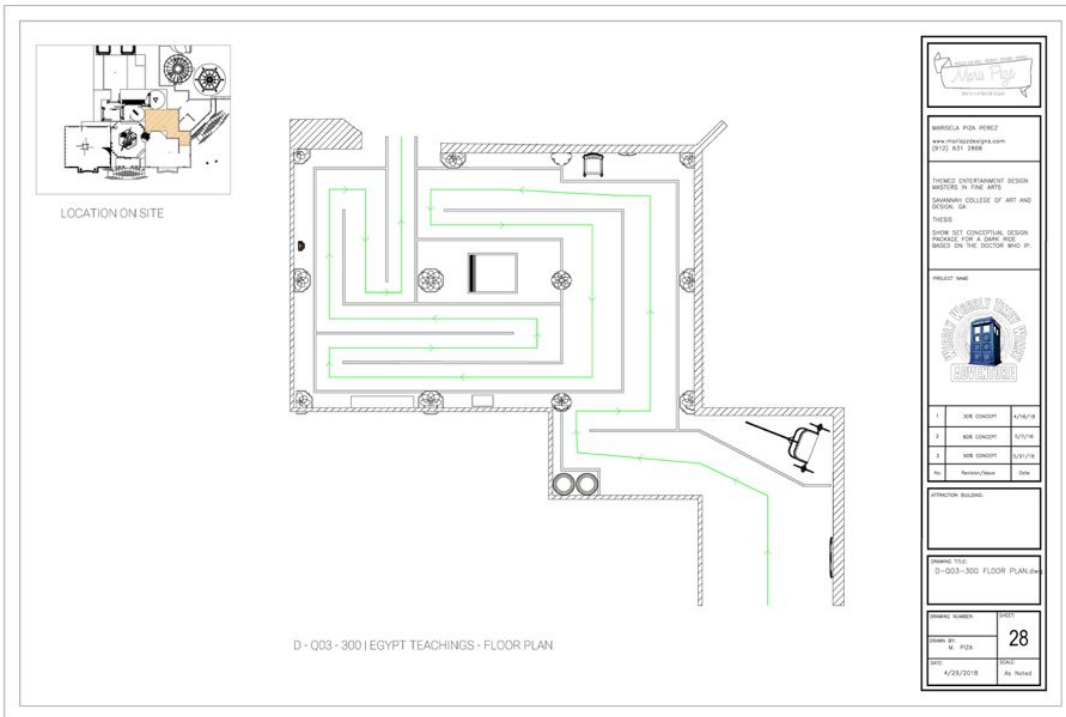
D-Q03-300 | Egypt Teachings - Floor Plan
